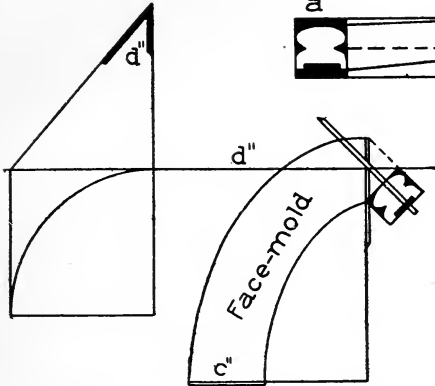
Face-Mould and Bevel for Wreath, Bottom Tangent Level, Top One Inclined.
